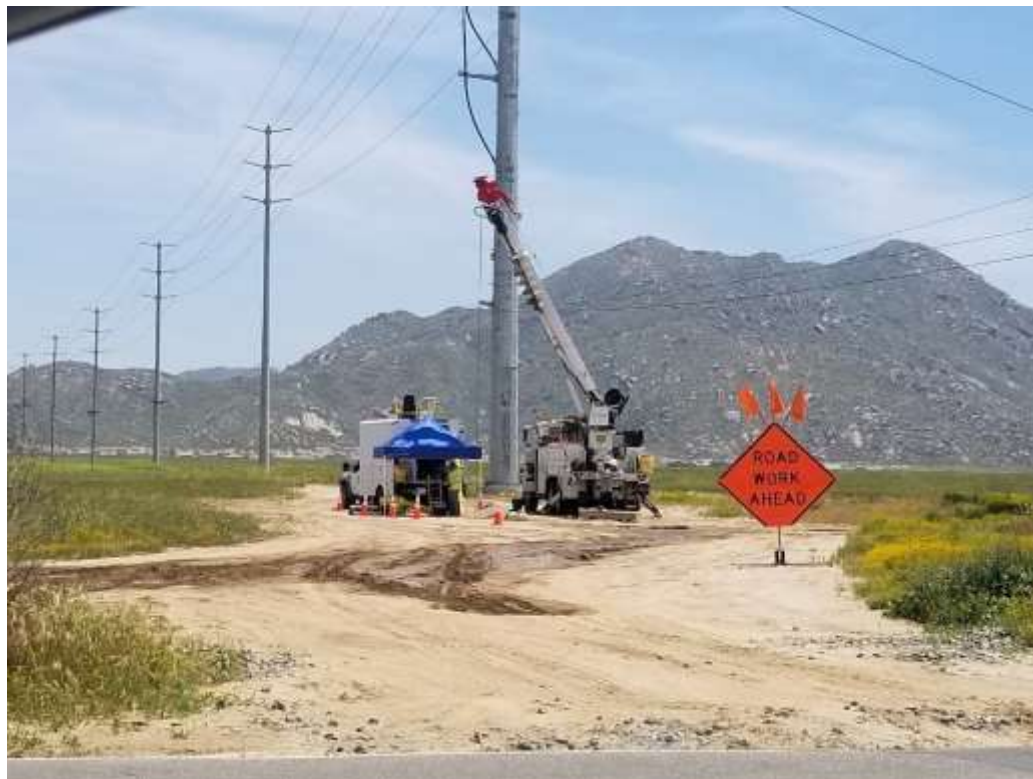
SCE crews working in vault at Construction Area UNK250 (April 29, 2020)
